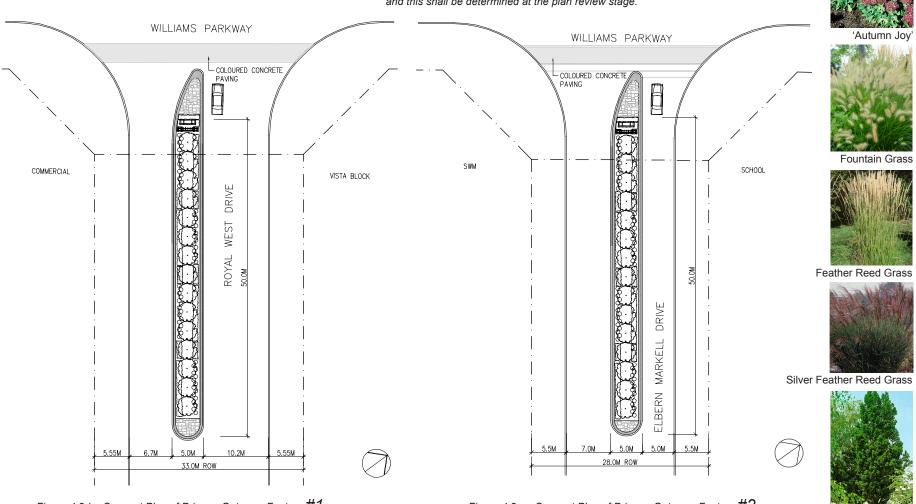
Concept Plan of Primary Gateway Feature #1
